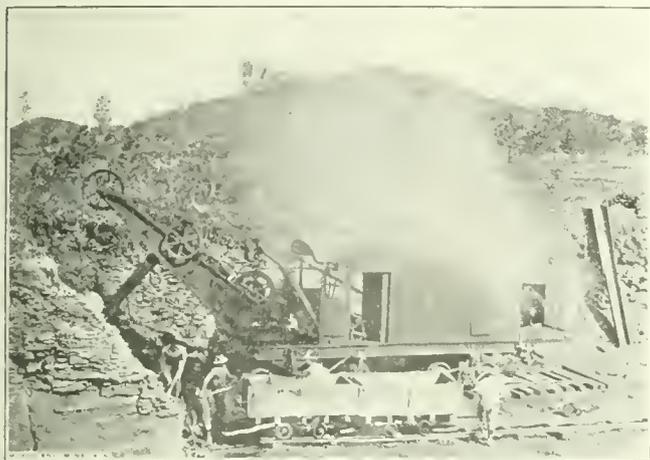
STEAM SHOVEL STRIPPING, WASP NO. 2
